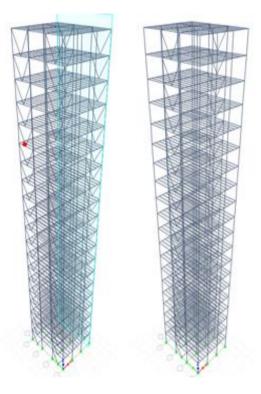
3D elevation view of V-bracings at outer and outer bays
